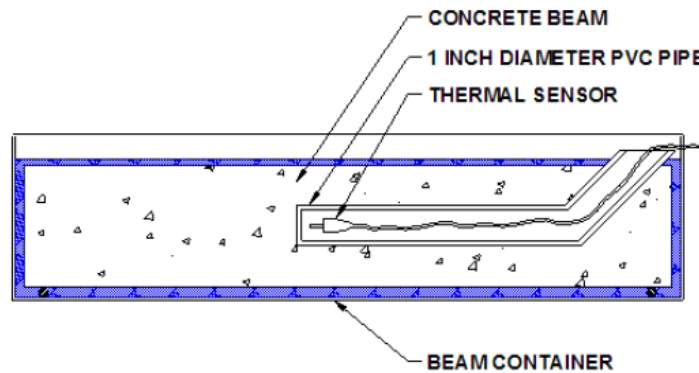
Thermal Sensor Installed at Center of Concrete Specimen
